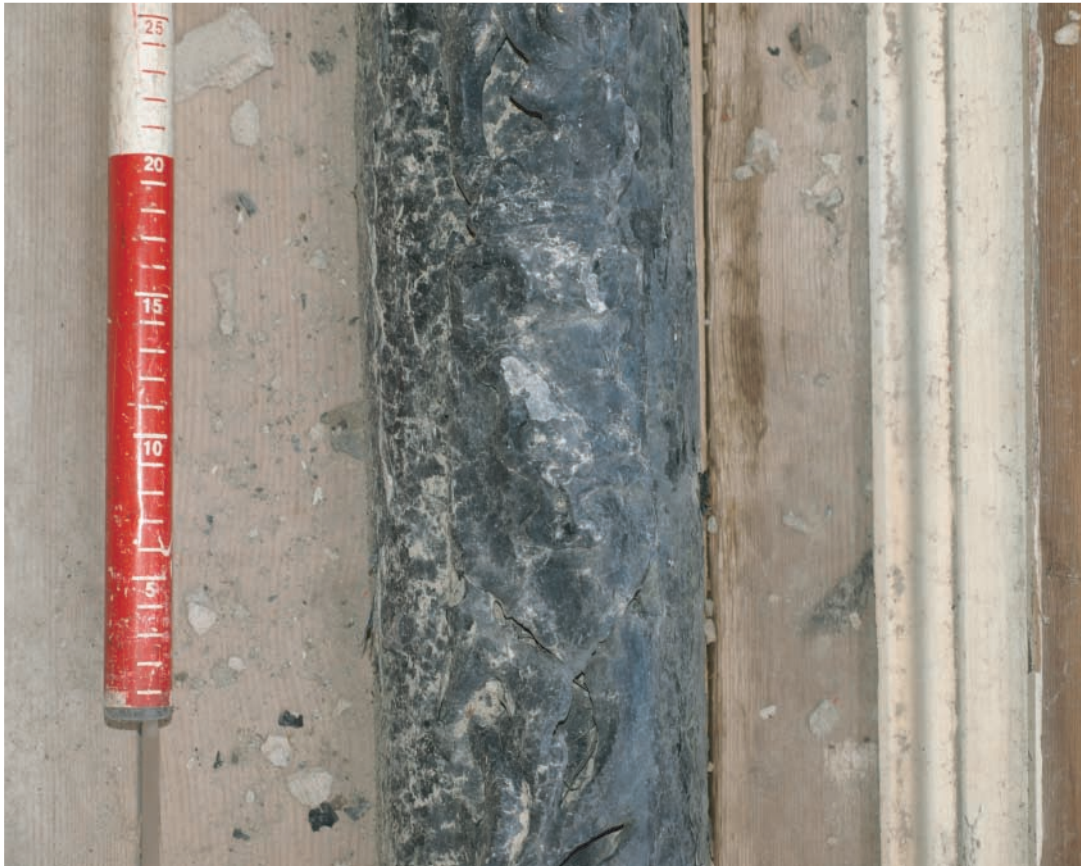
Llanelly House - Detail of lead drain pipe from west facing elevation. Shows filigree and other motifs, hard to discern from this photo.
